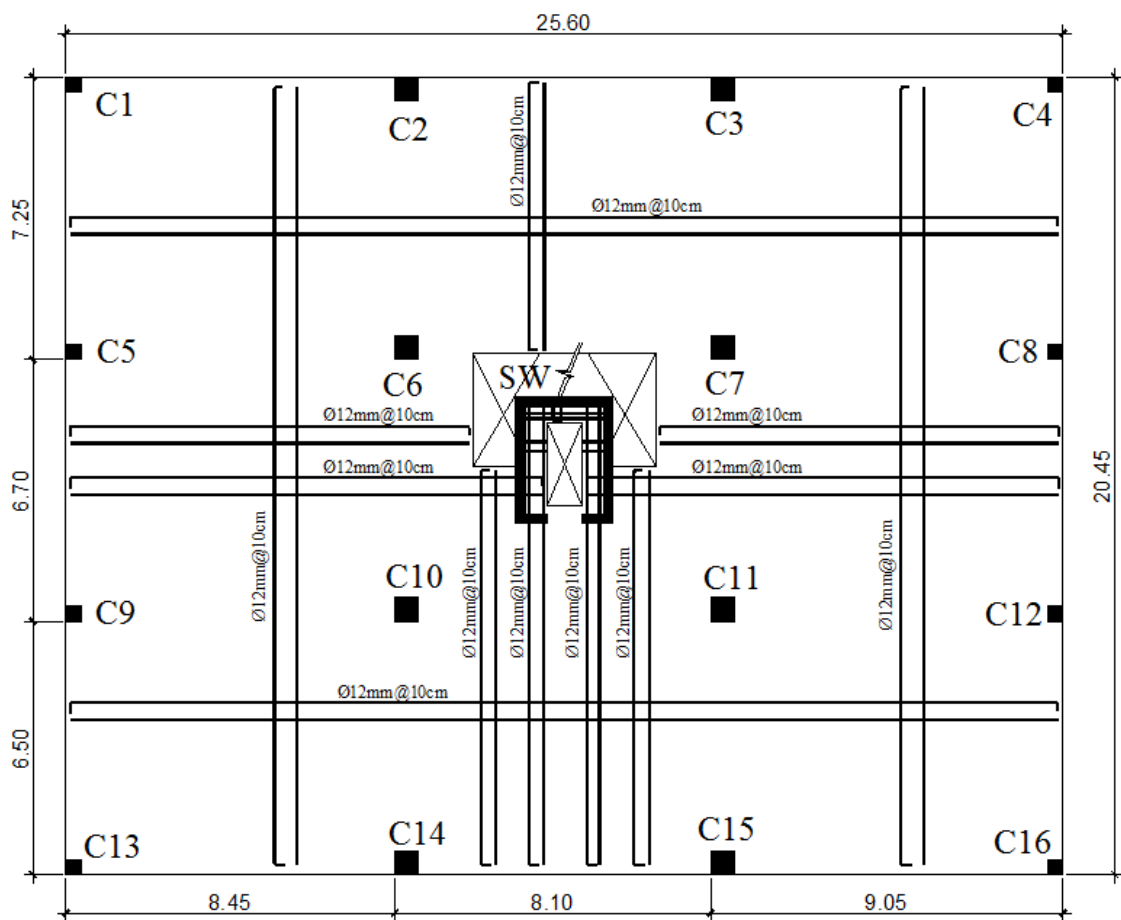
Reinforcement details of the slab (Ground – 3rd Floor).
